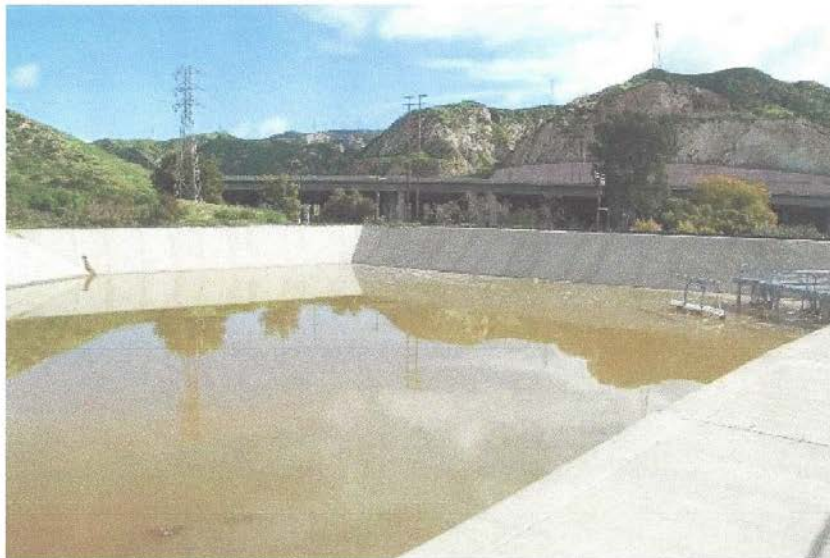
Raised skimmers and water level at decant towers at Terminal Basin
